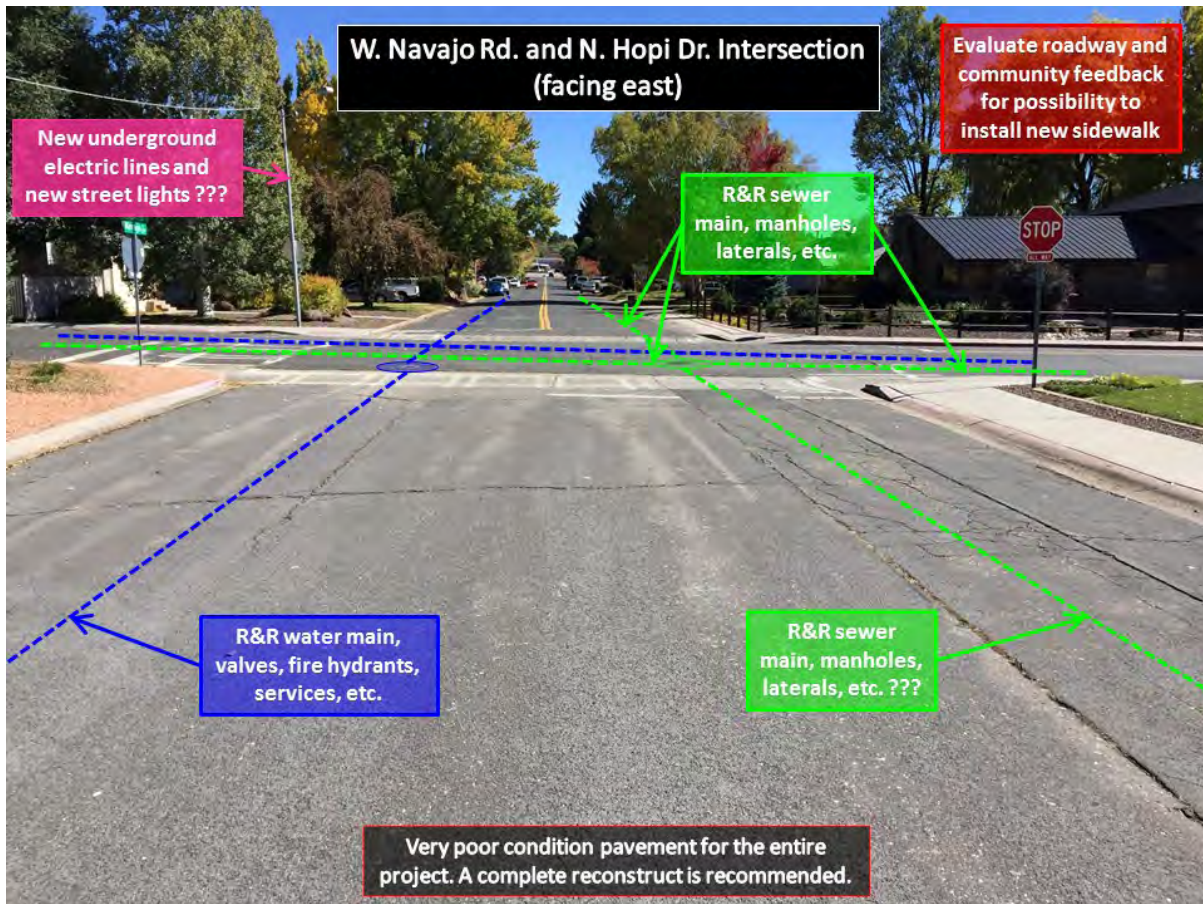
R&R water/sewer??? mains & appurtenances, pavement section, and street lights???
